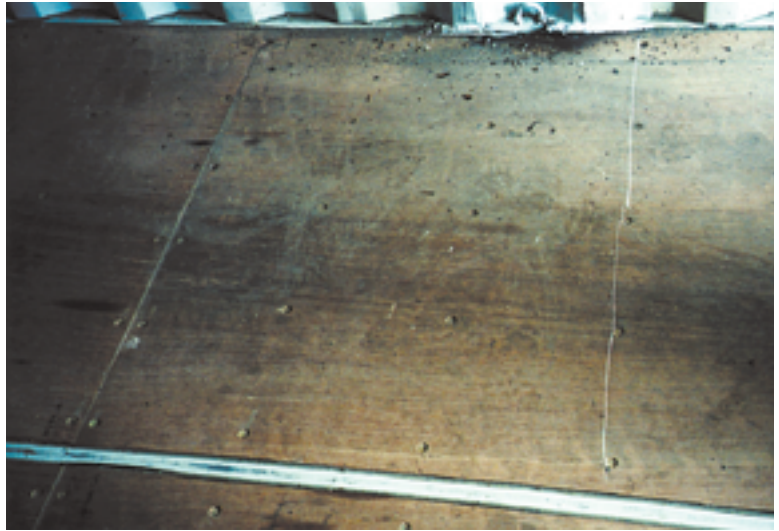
(below) / Plank floor joint lying above center line of crossmember flange
